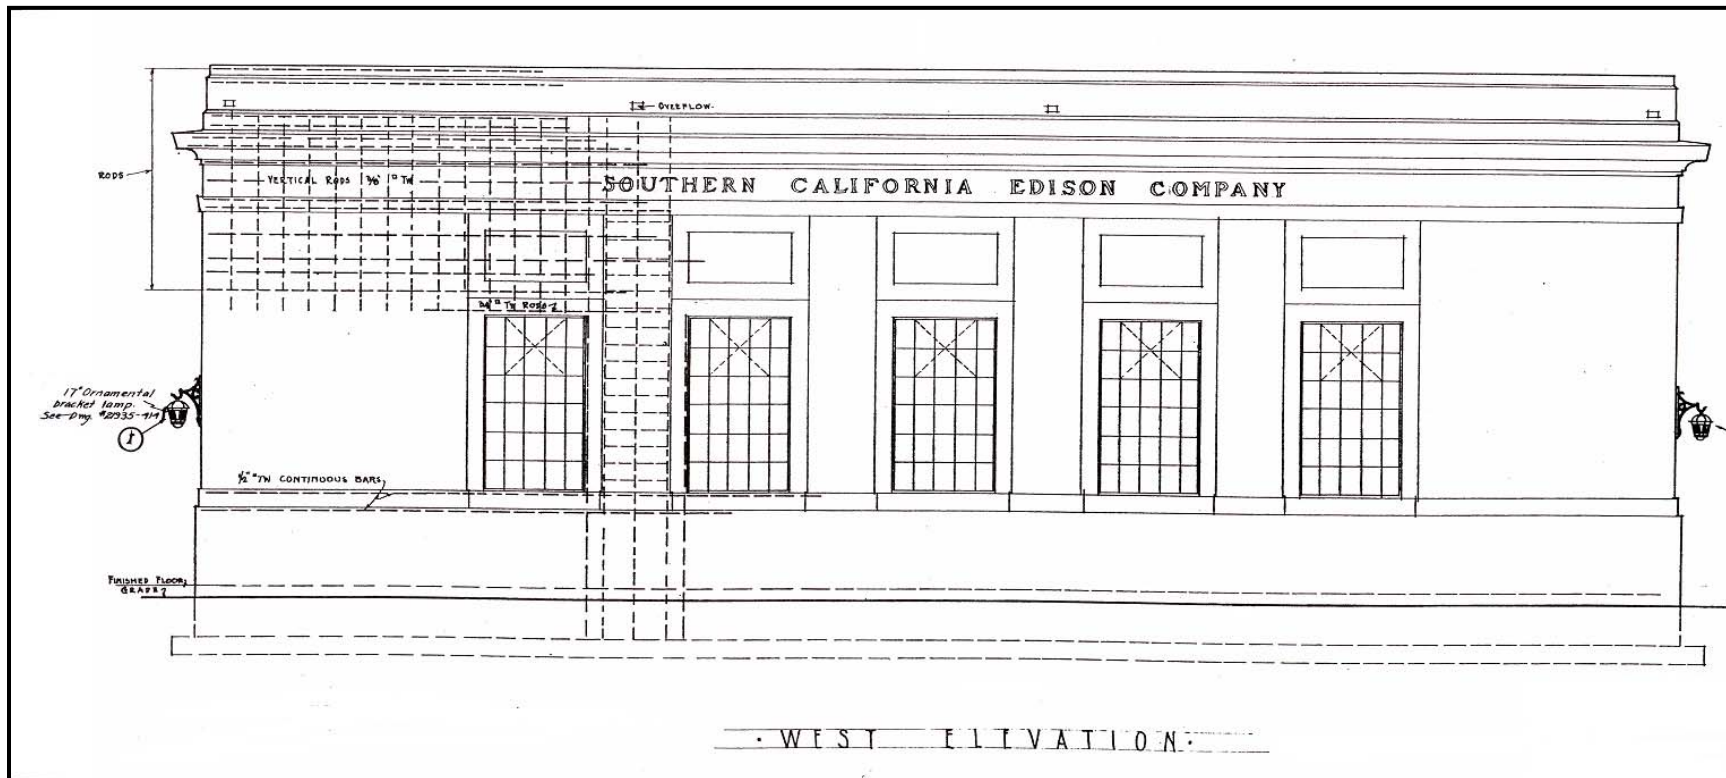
Architectural Diagram of West Elevation of Southern California Edison (San Diego Gas & Electric) Building, ca. 1917.
